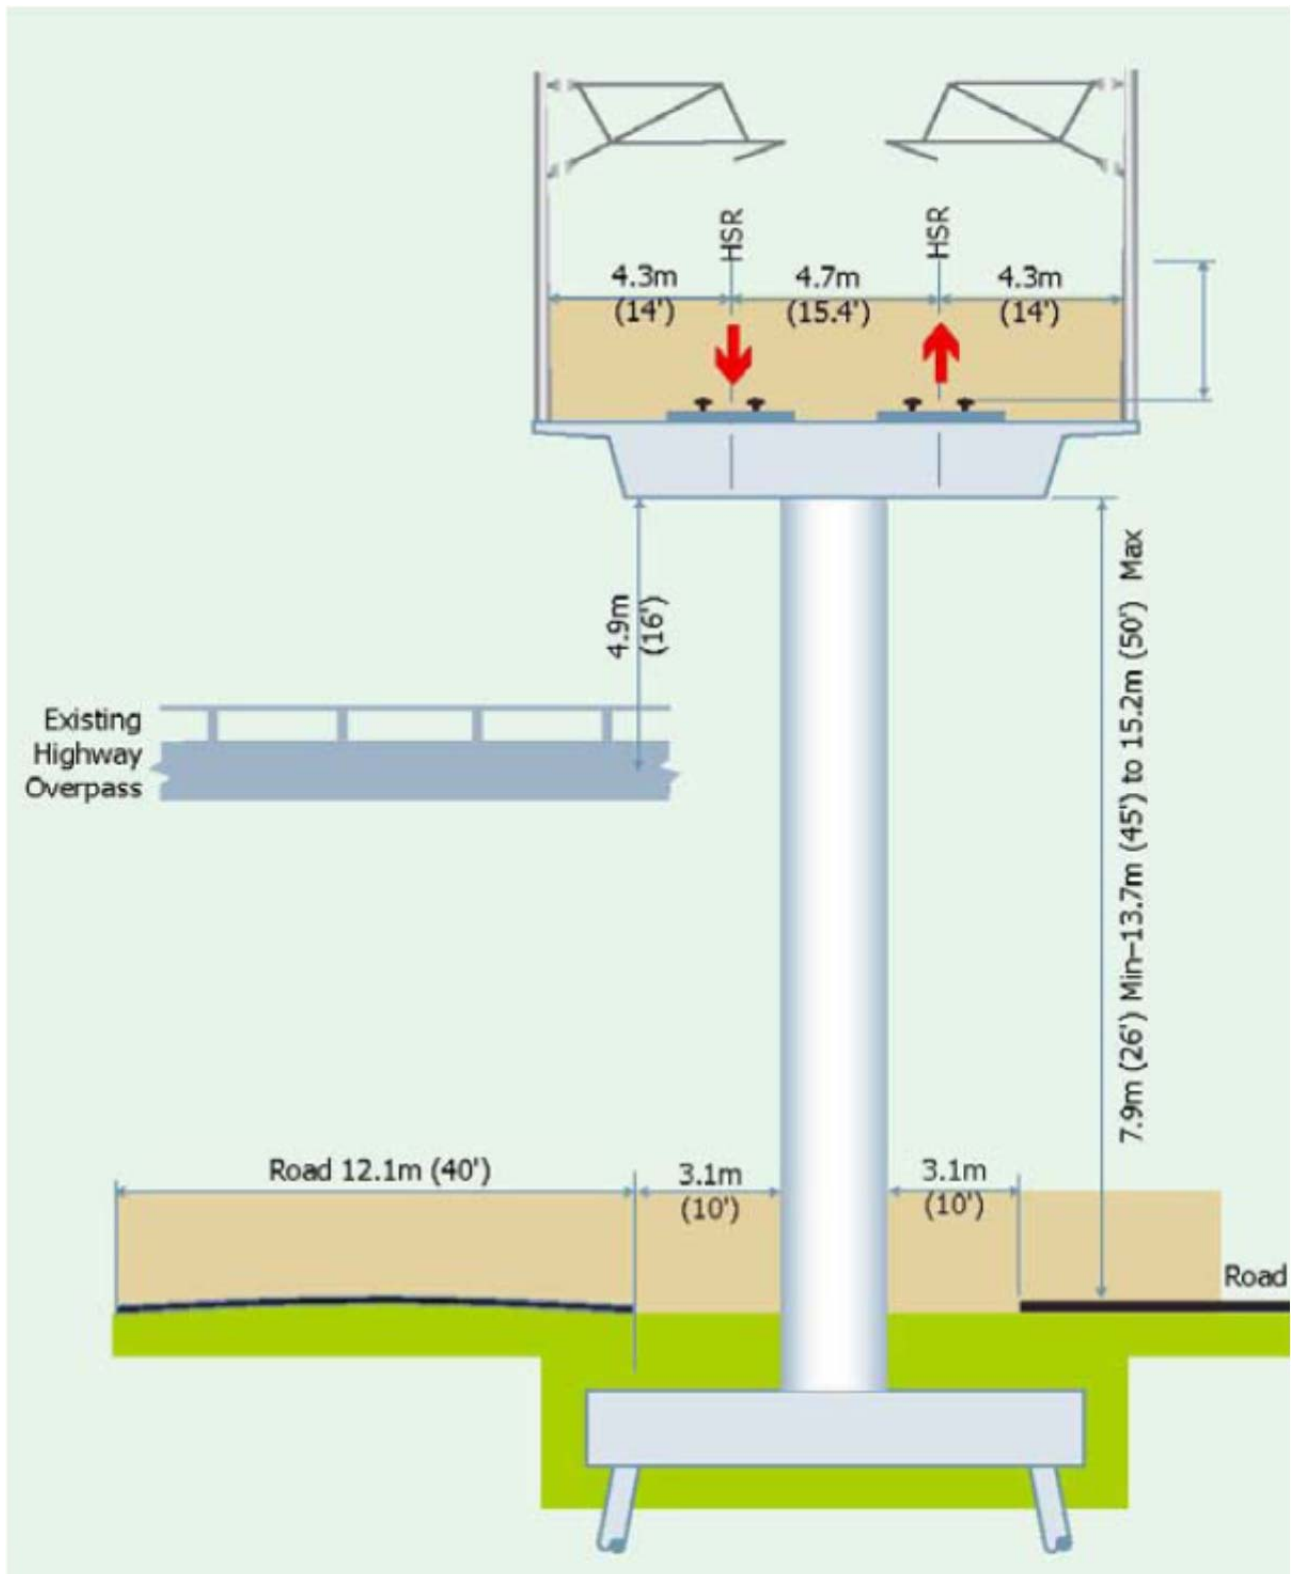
California to Nevada Elevated HSR above Highway Overpass and Road Cross Section
